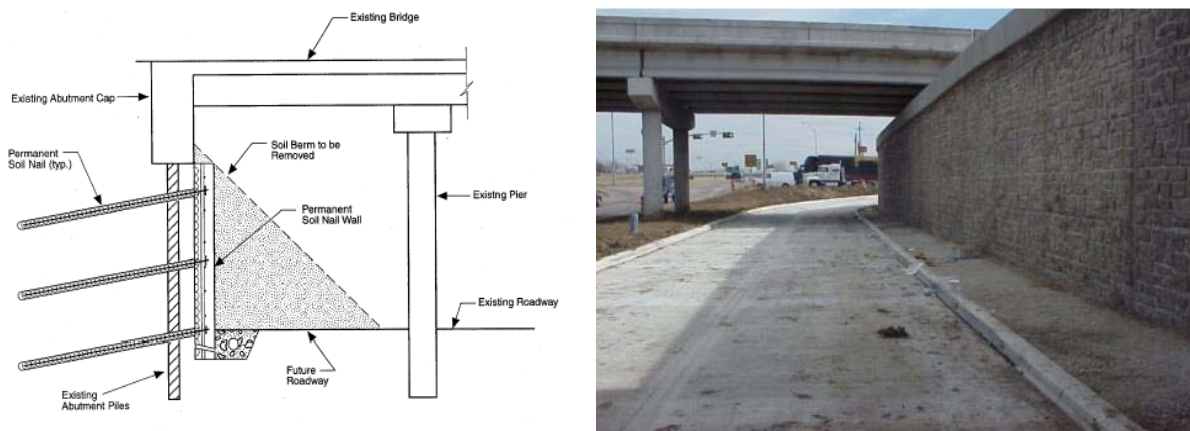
Typical Soil Nail Wall Texas Turnaround.
